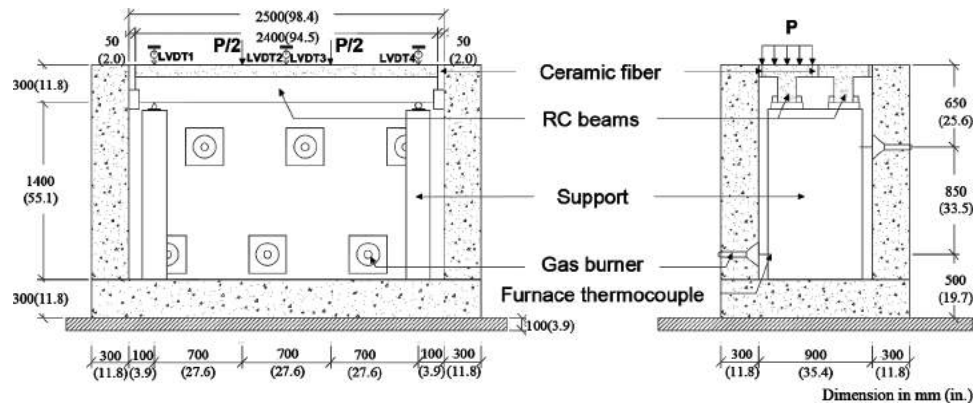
Test setup for pair of RC T-beams inside fire test furnace.
